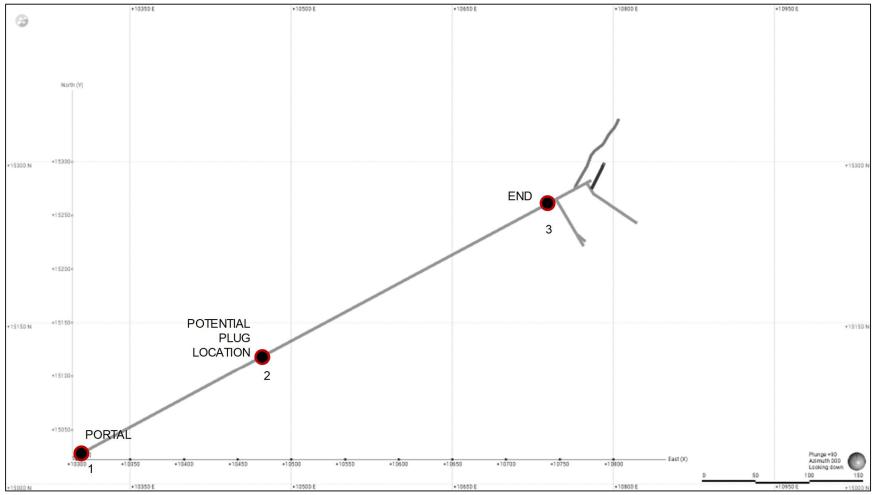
5900 Level Underground Workings with Proposed Inspection Locations
